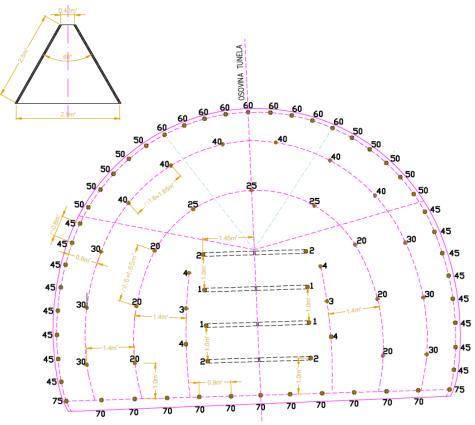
New layout scheme of blast holes and detonators on the tunnel face
